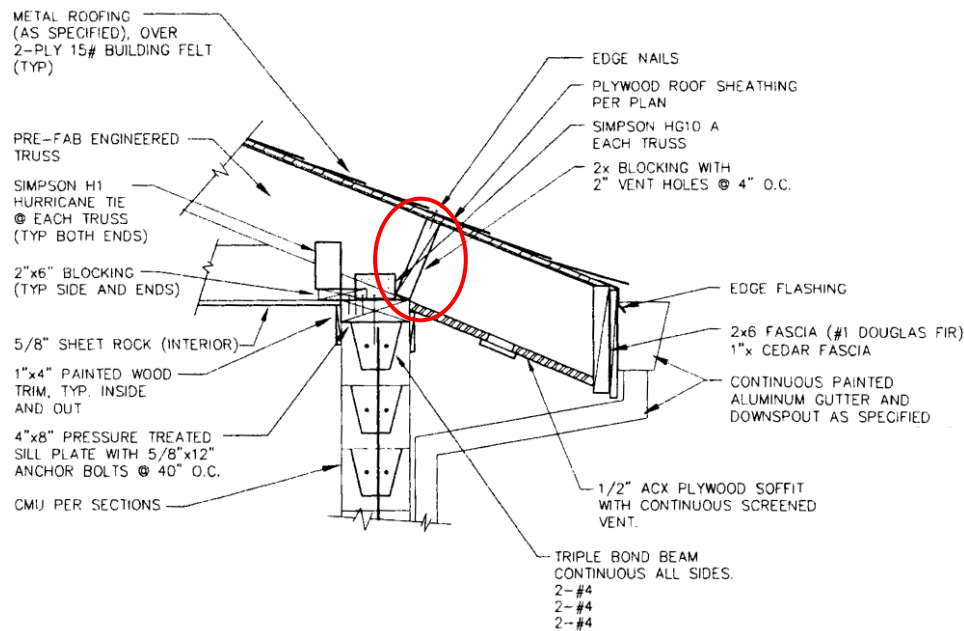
Inadequate Connection between Blocking and Masonry Wall Top Plate
